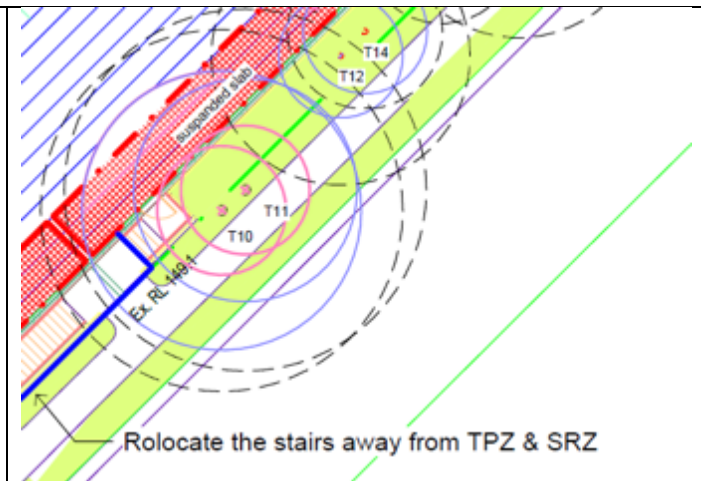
Level 0 Plan - Tree 11 Showing roof space, suspended slab (couter level).
